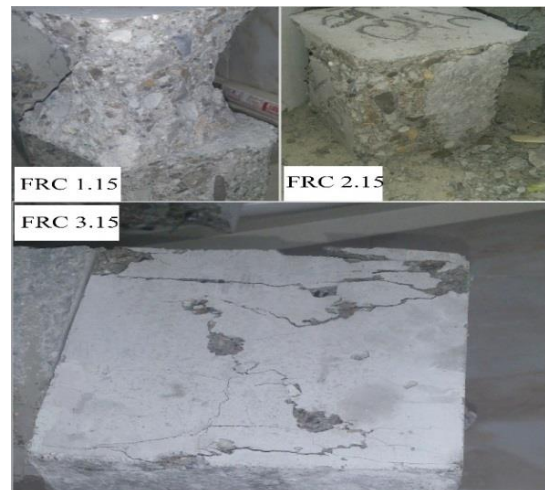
Specimens containing 0.15% PET fiber after compressive test
